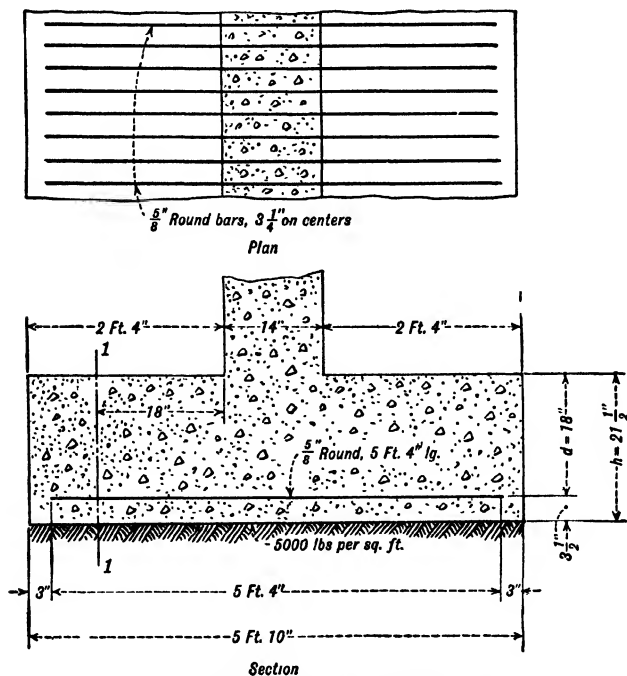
Details of Reinforced Concrete Wall Footing. (See p. 484.)
